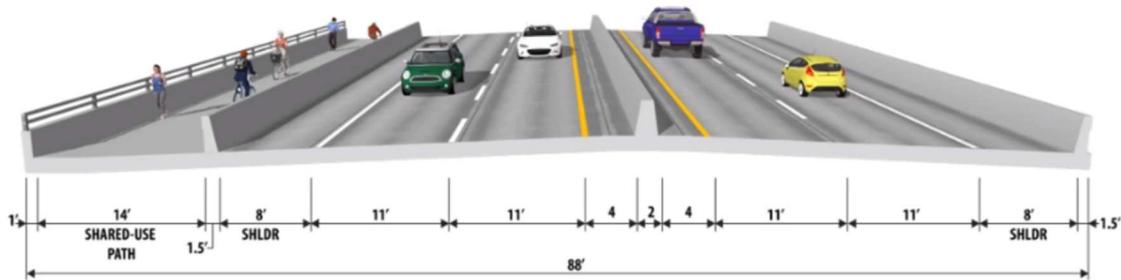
Typical Section of the Proposed Broad Causeway Bridge
